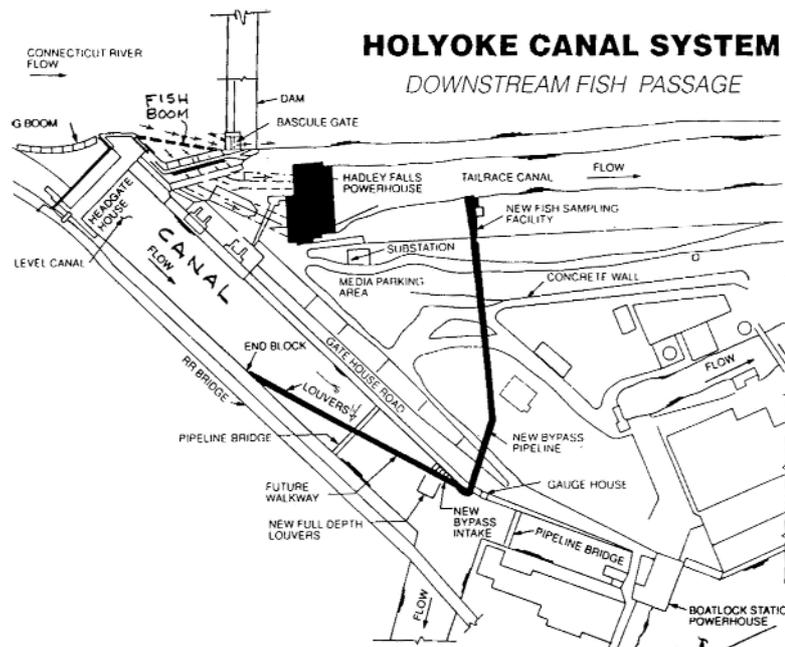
Plan view of Holyoke Dam and the First Level Canal showing the louver array in the canal to guide downstream migrant American shad and Atlantic salmon to a bypass.
